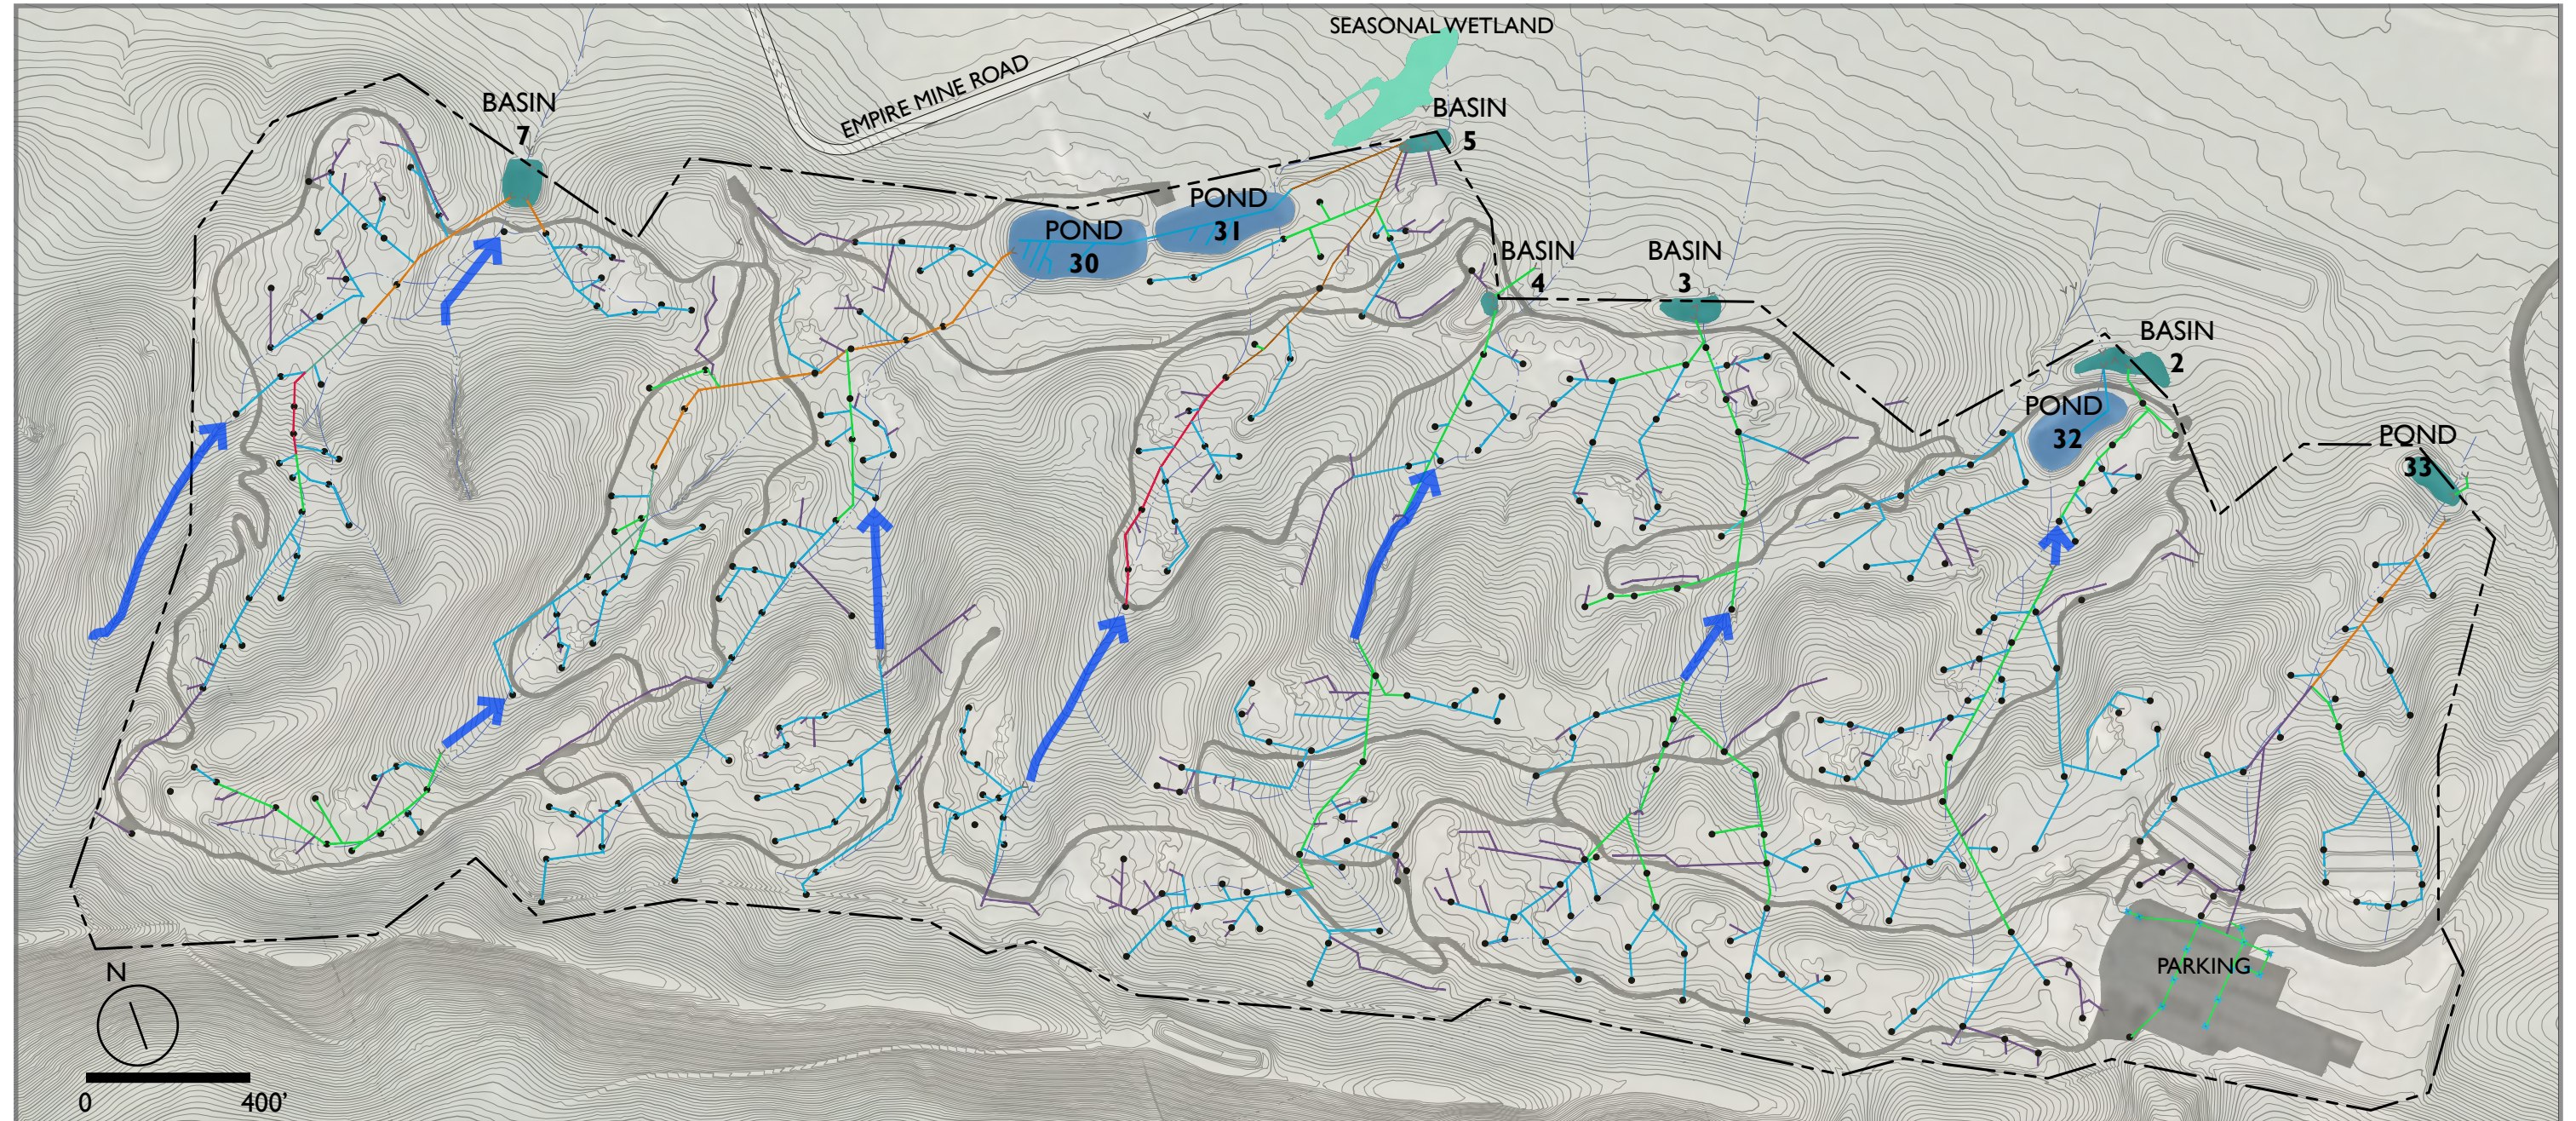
EXISTING DRAINAGE DIAGRAM (RDG, 2020)
